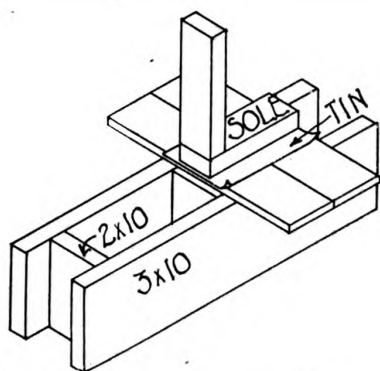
Correct construction of partition running parallel with joists, no bearing partitions being placed below. Space is left for running heating pipes, etc., without cutting joists. The piece of tin acts as a fire stop.
